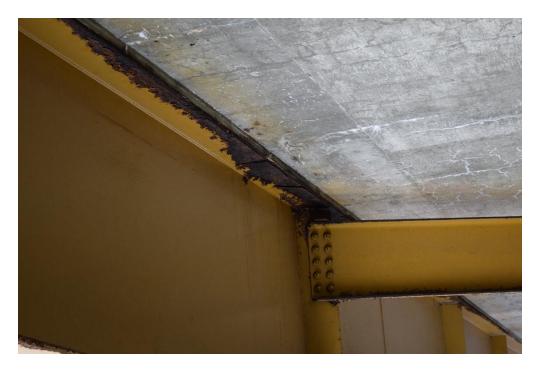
Girder 4 Top Flange from North Abutment, Localized Flaking/Section Loss
